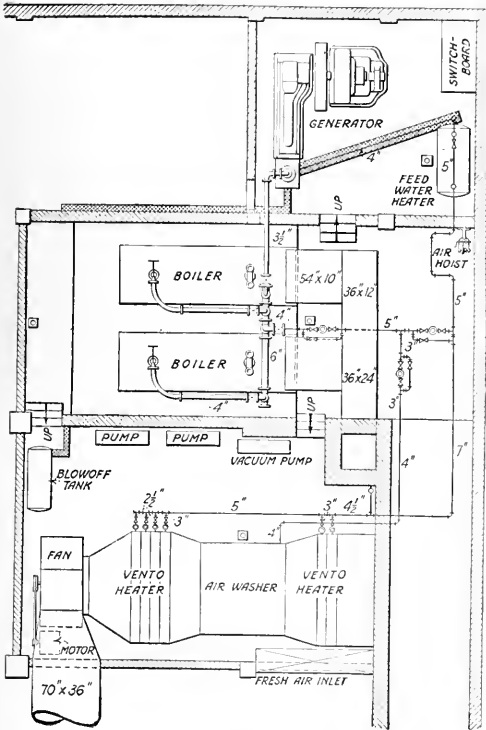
PLAN OF ENGINE, BOILER AND AIR-WASHING ROOMS
